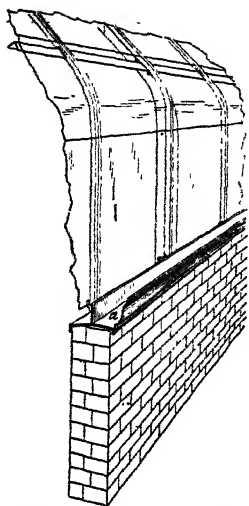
Type of gutter (a) used on curved-eave houses.
